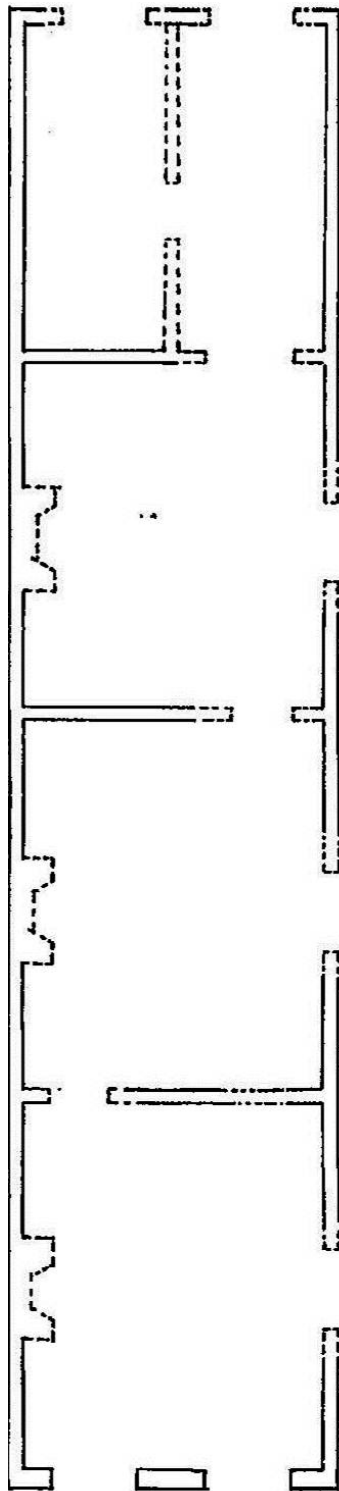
Reconstructed floor plan of 422 Burgundy. Reconstructed by Naohito Okude. 1986.
